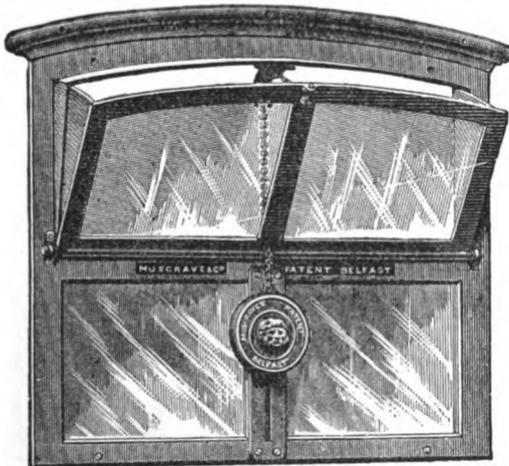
Sheringham Ventilating Window (Musgrave).
